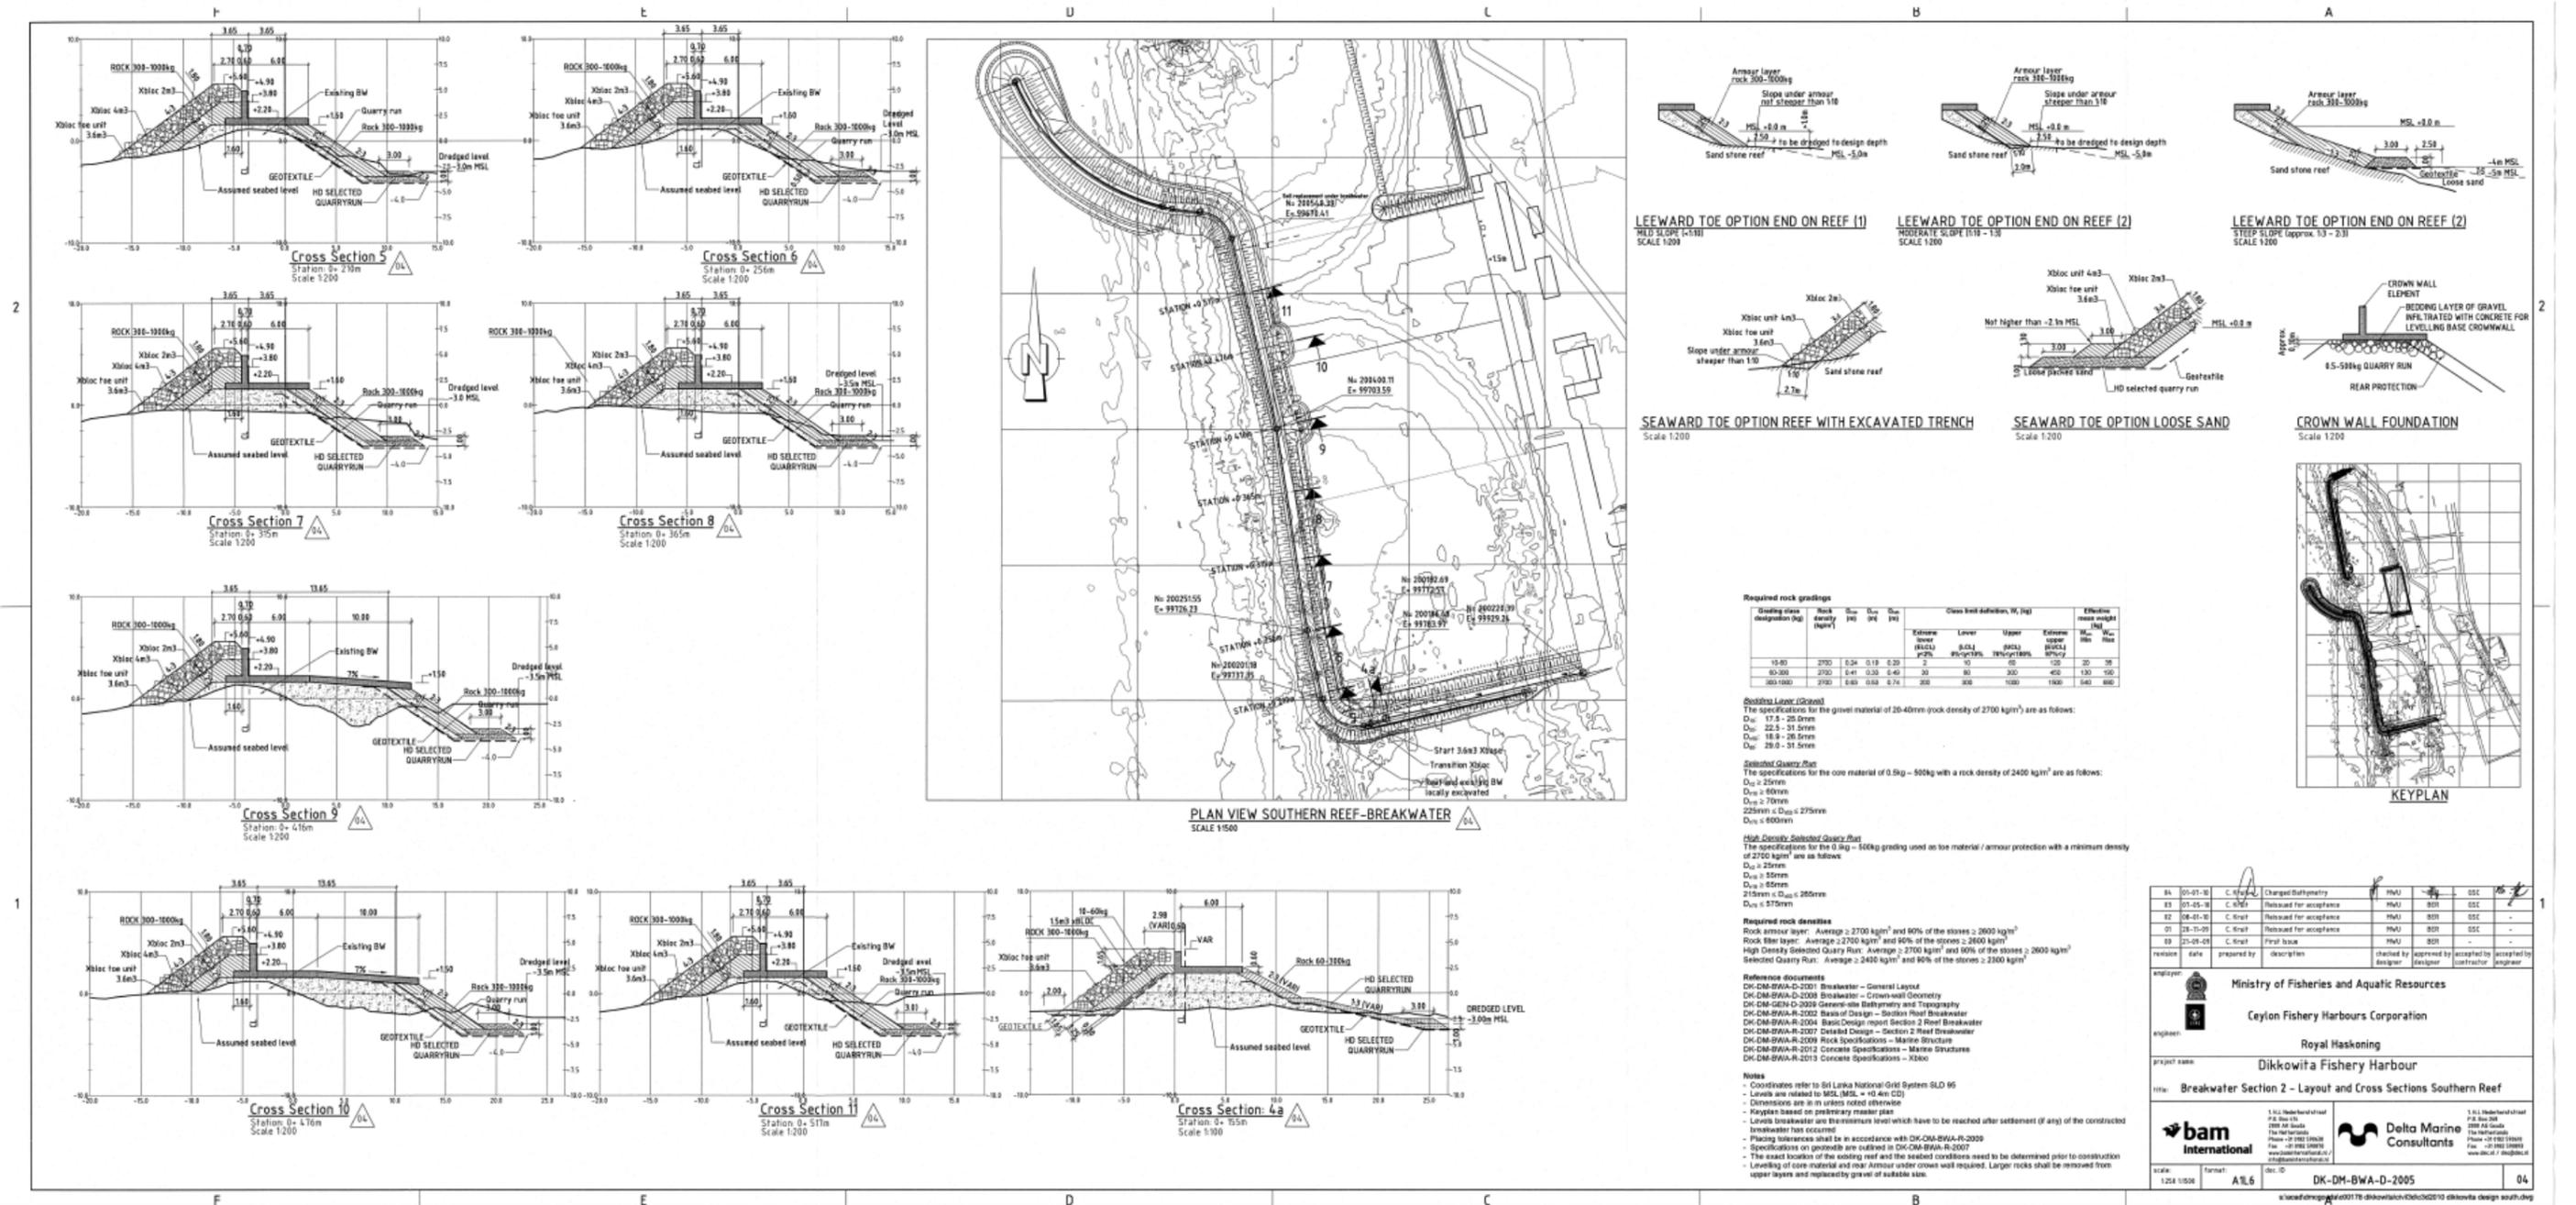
Layout and Cross Sections Southern Reef Breakwater Dikkowita Fishery Harbour
